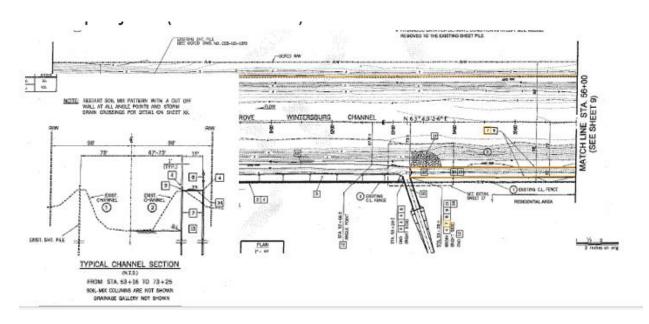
Double sheetpile begins at Station 53+16 on the south side, further reducing the likelihood of failure with project (Drawing C05-101-14).
